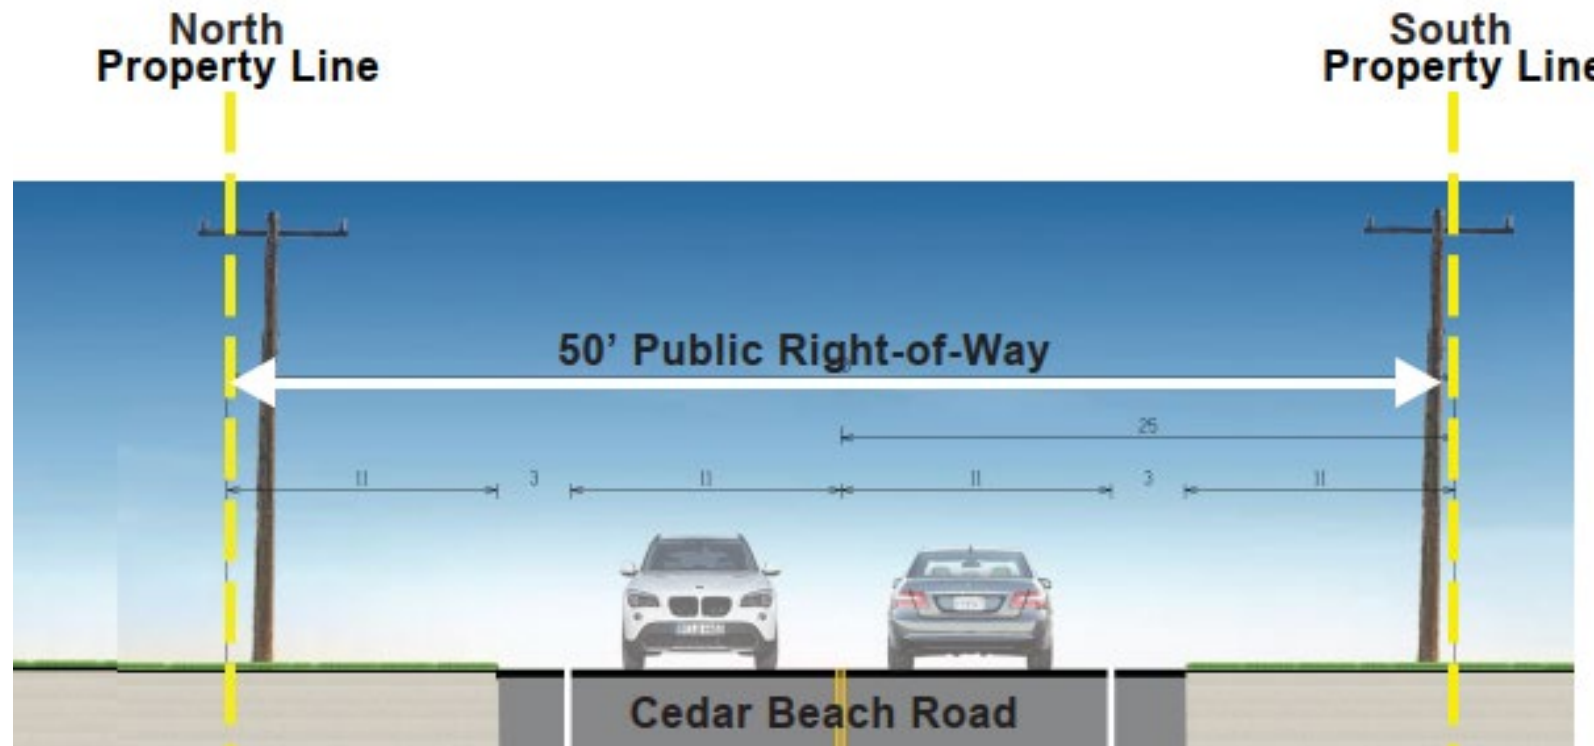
Segment 1 existing typical section looking eastbound towards Slaughter Beach
